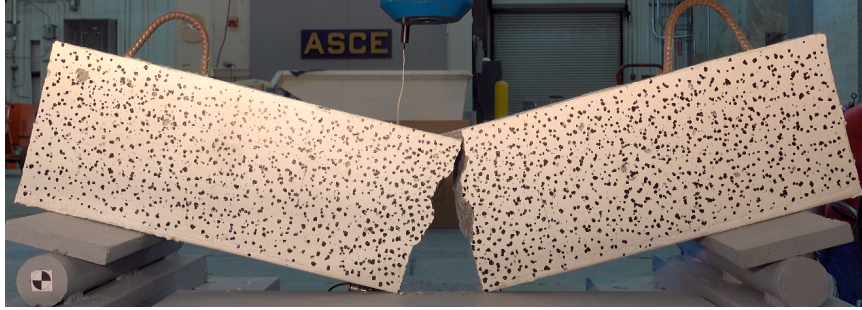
Four-foot “as-built” unreinforced concrete beam behavior.
